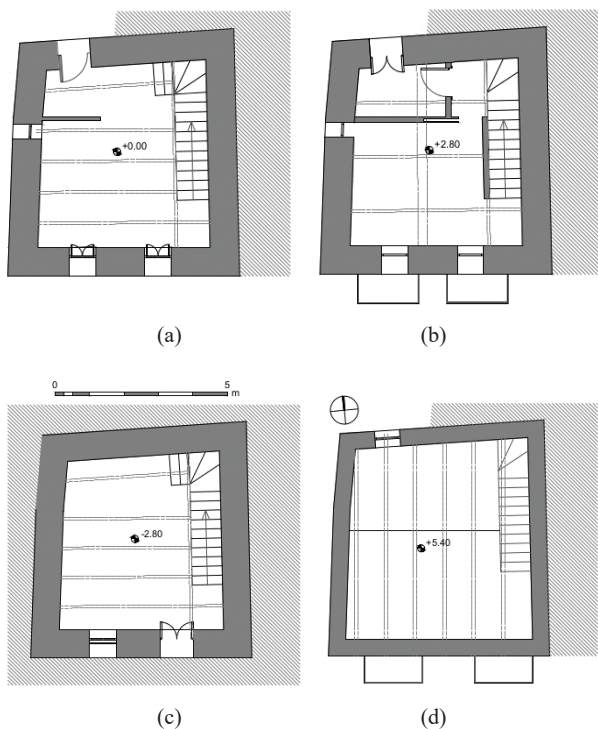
Plans: (a) Ground level, (b) 1st level, (c) basement, (d) attic area
